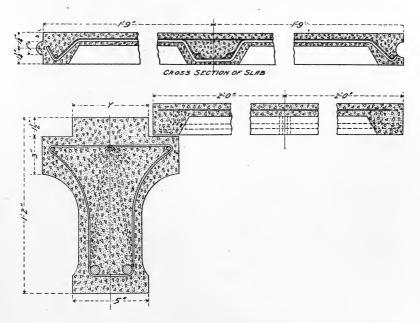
Detail of Watson system. Separately moulded members, combined slab and beam construction.
